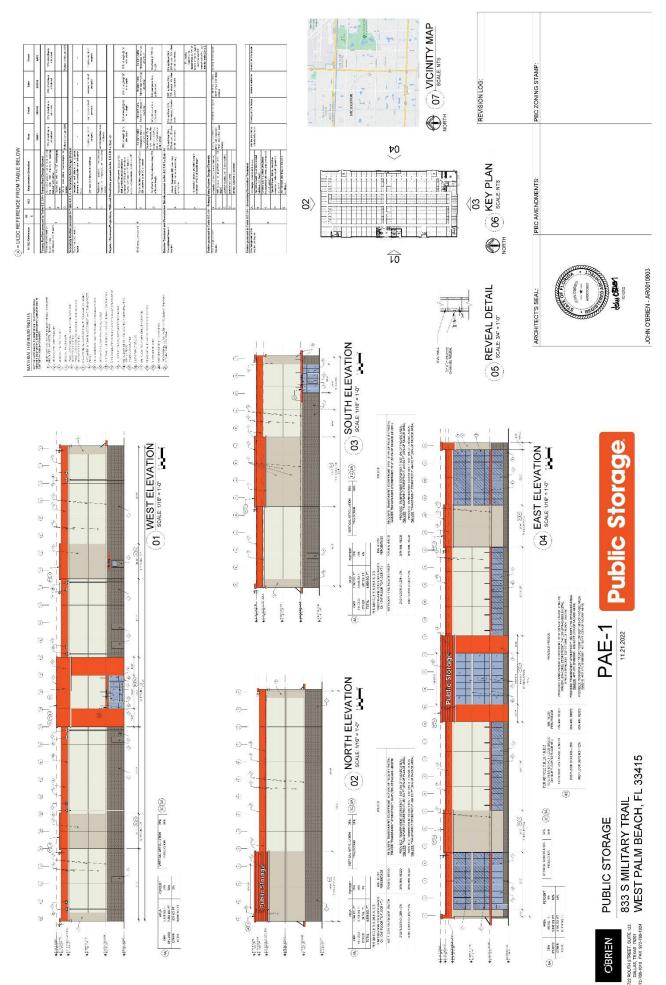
Preliminary Architectural Elevations dated November 21, 2022
